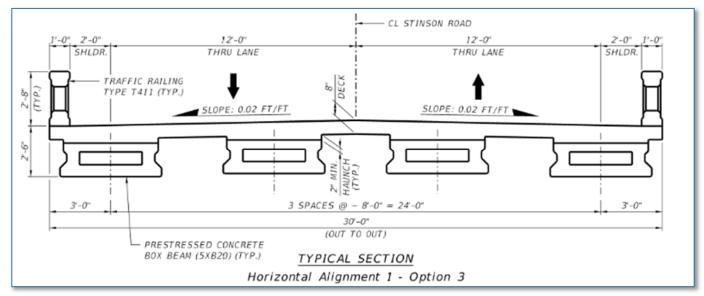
TxDOT Prestressed Concrete XBeams (5XB20) Typical Section
